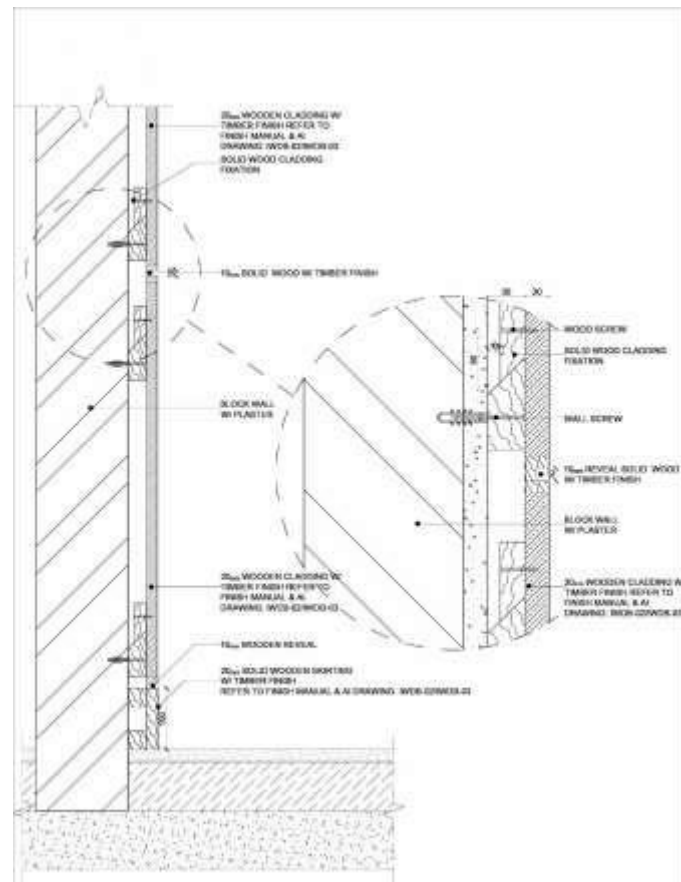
; Typical dry wall section Source: Ellen Mac Arthur Foundation.
